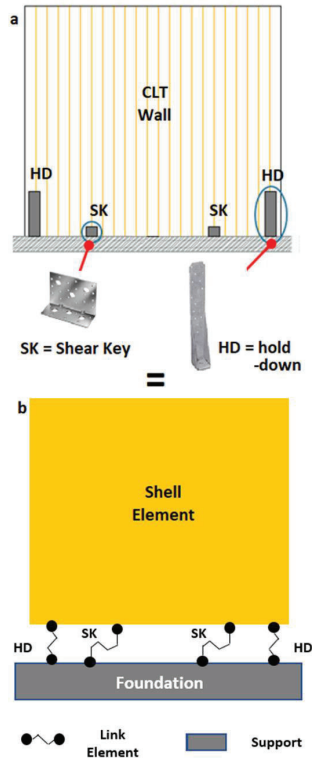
(a) Typical CLT shear wall configuration used in the building, (b) schematic of FE model for CLT shear walls.
